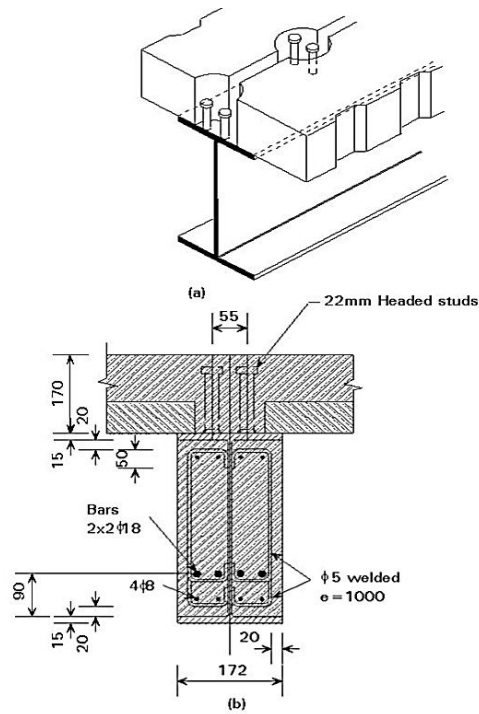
Instead of an in situ concrete slab, precast concrete floor or deck units can be used [2].
